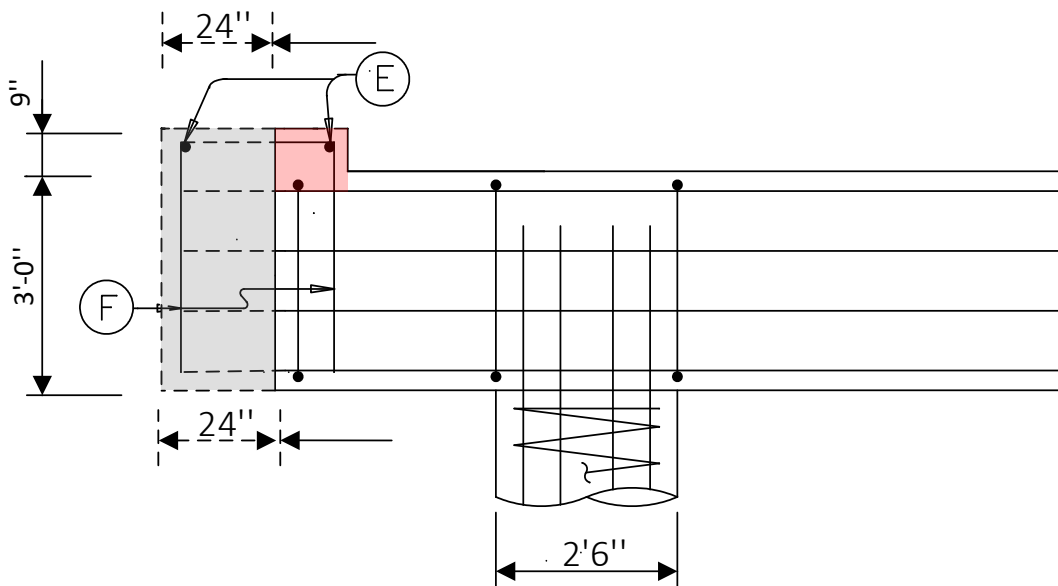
Modified earwall for slab beam bridge (elevation)
